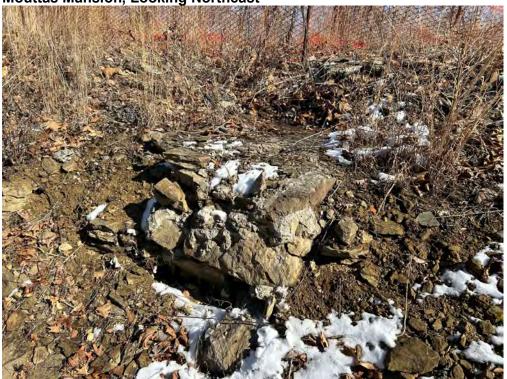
Insignificant Stone and Concrete Foundation Remnant from the Original Location of the Mouttas Mansion, Looking Northeast
